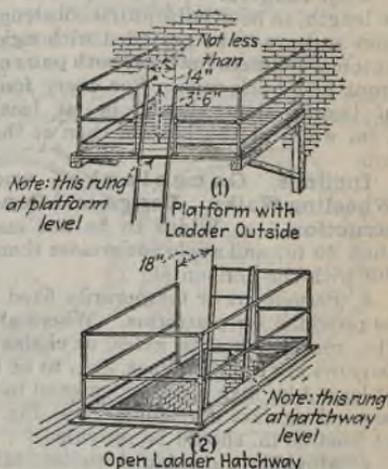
Arrangement of ladders at hatchways and platforms.
